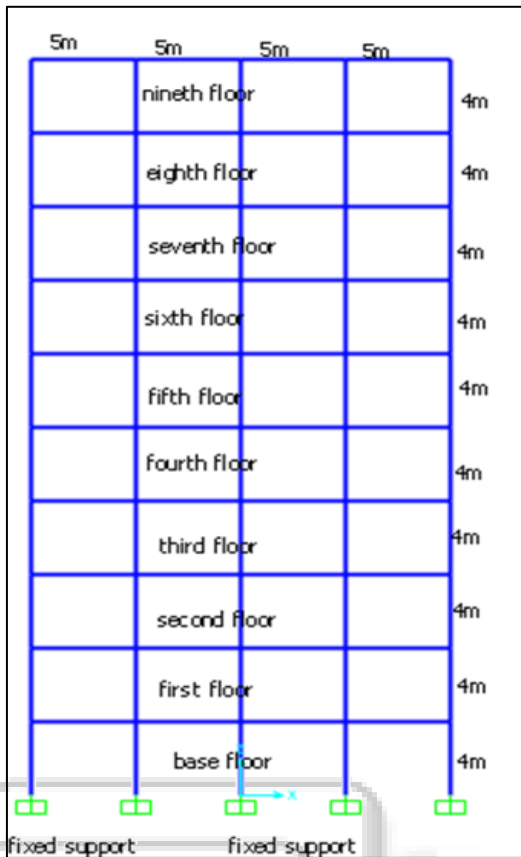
elevation plane of 10 storey 2d building structure without shear wall
